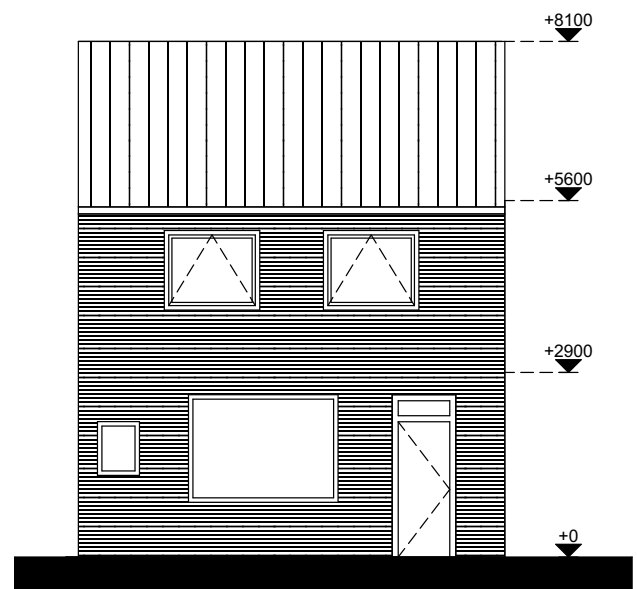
Drawings of case study facade 1 & 2 (Own drawing)
